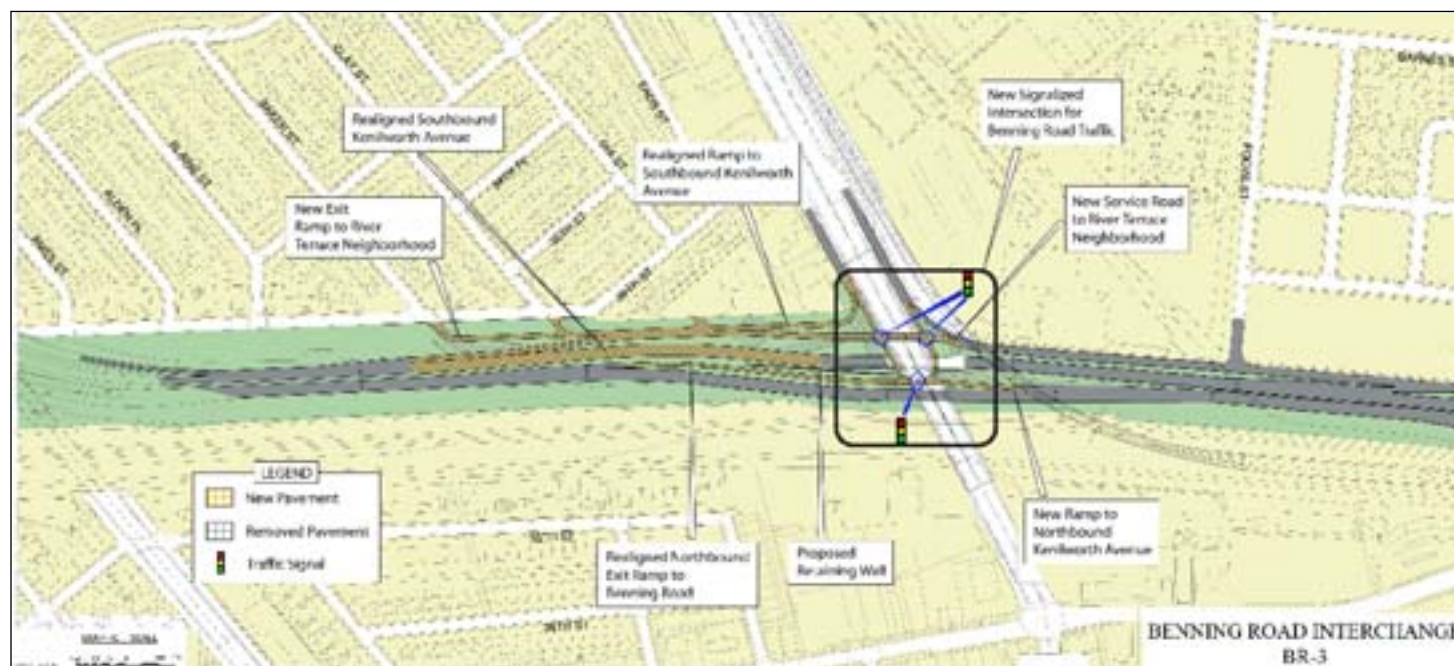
Scenario BR-3 (New center-leg ramp to the south of the Benning Road bridge)
